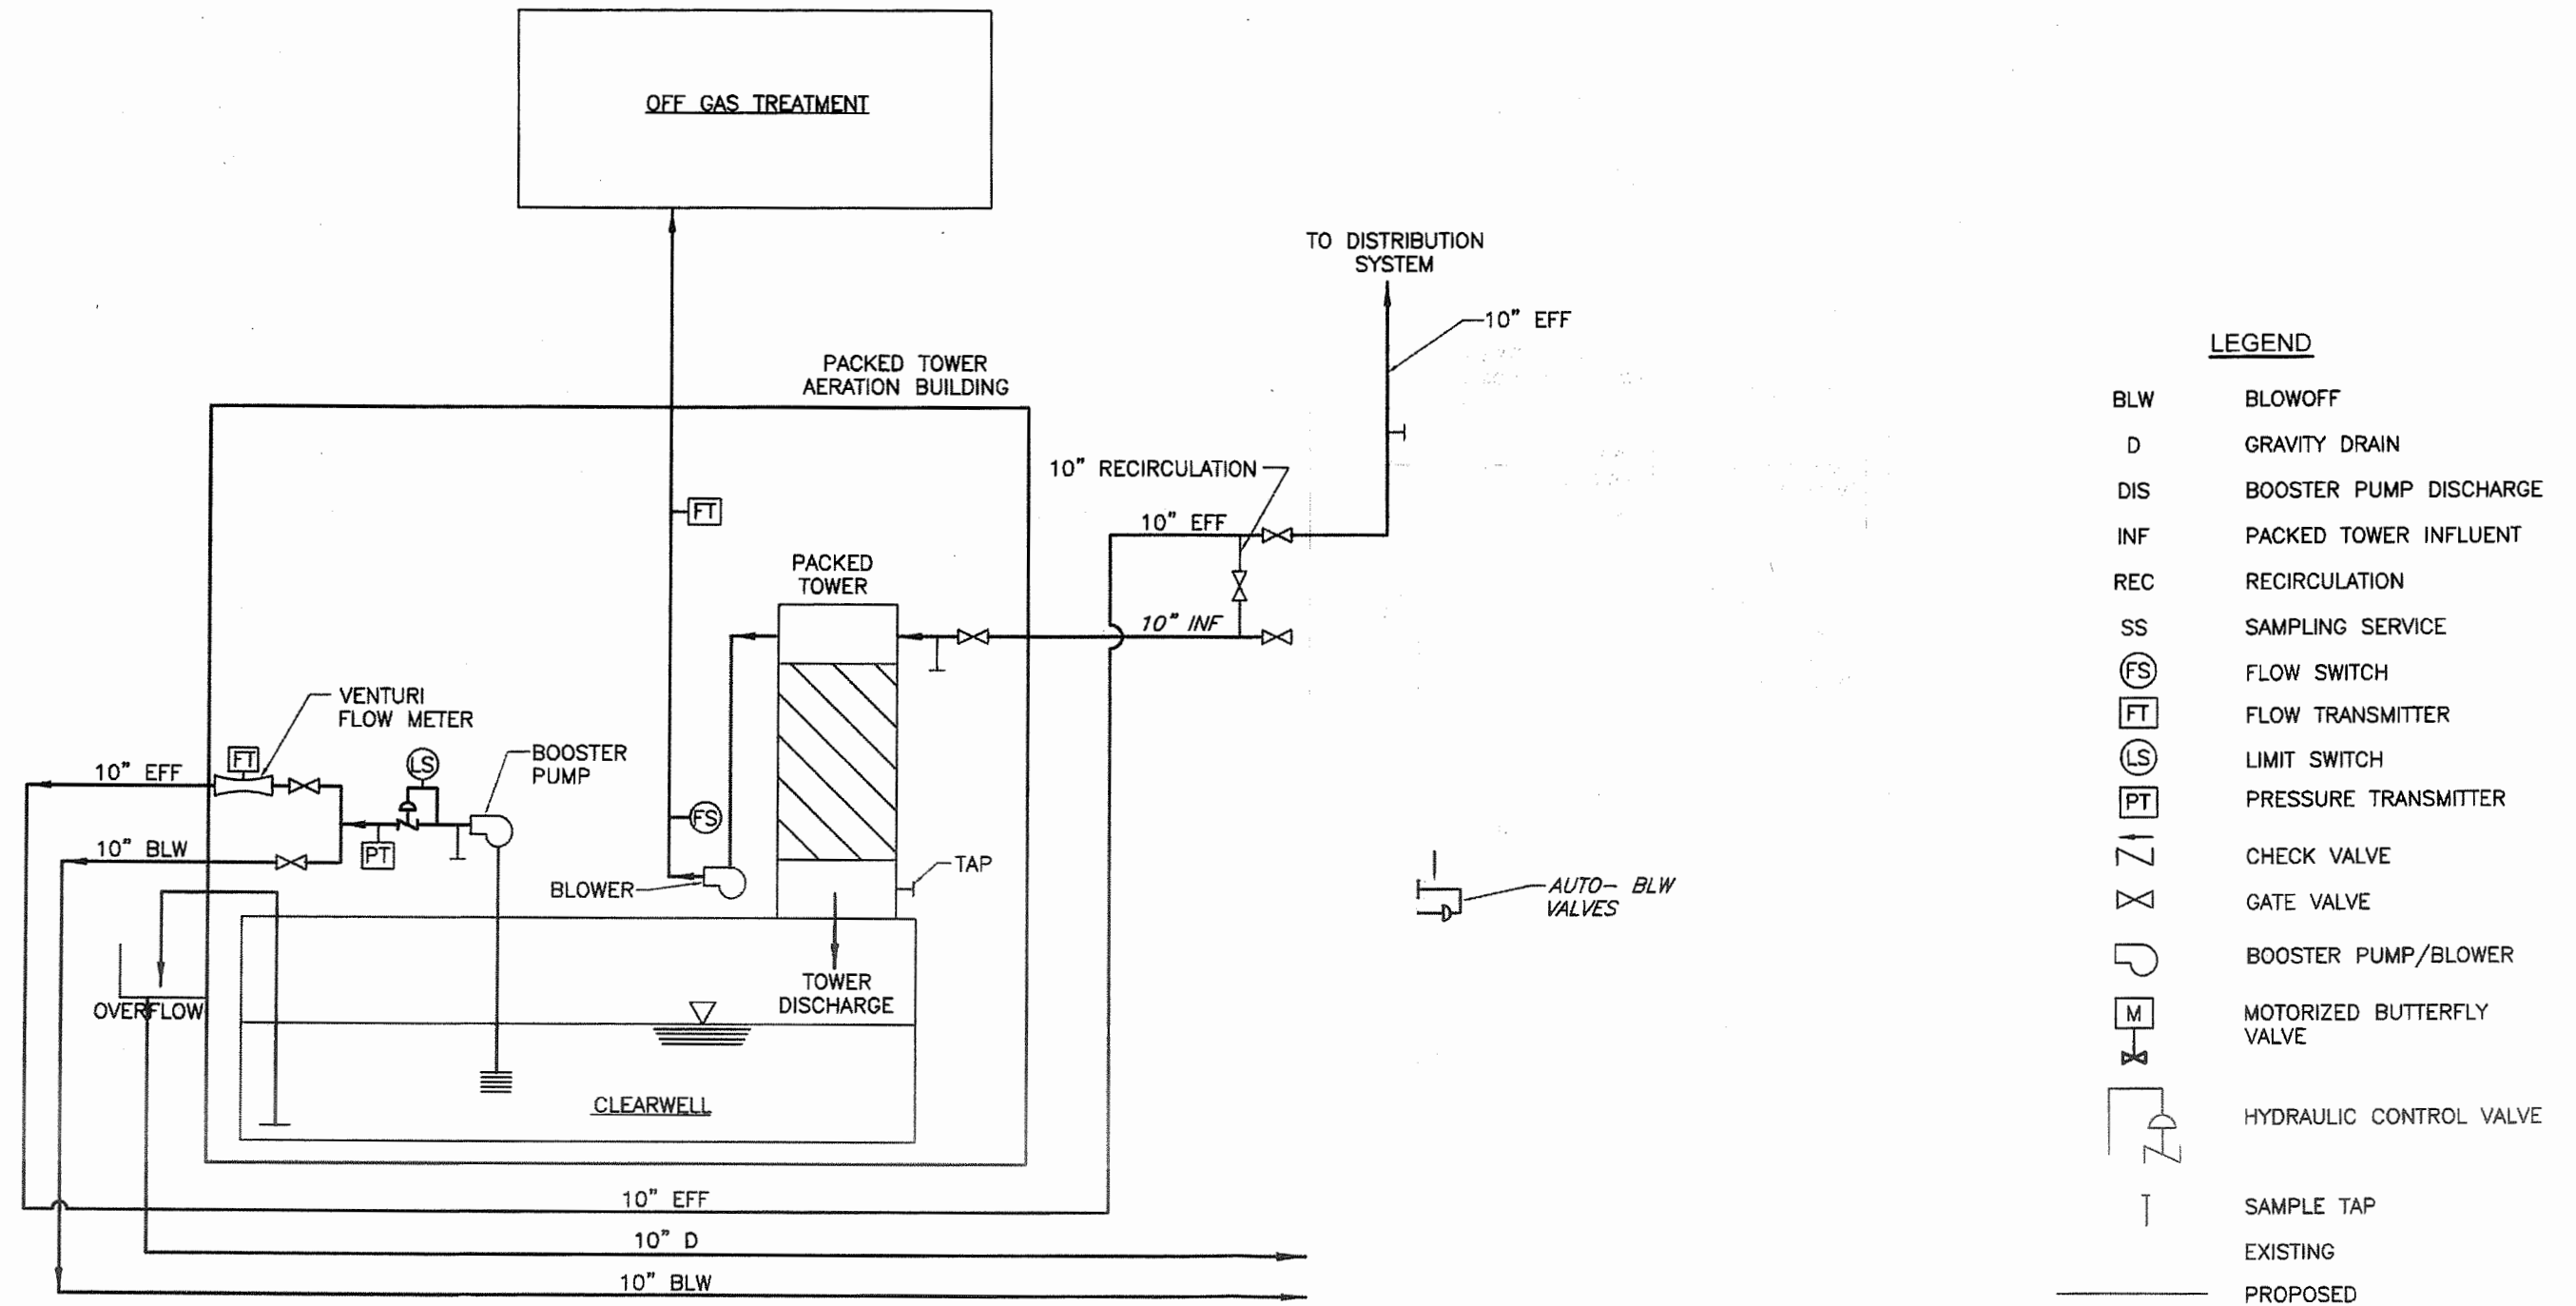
shows a schematic of the proposed piping for the packed tower aeration system in conjunction with the existing well station. Figure 4-2 shows the proposed site plan.
